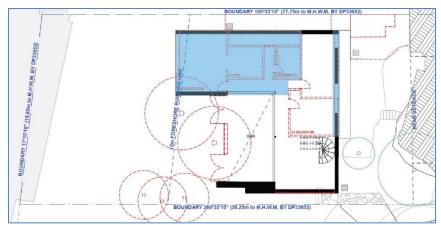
No demolition is to occur in the blue shaded area except as noted above.
